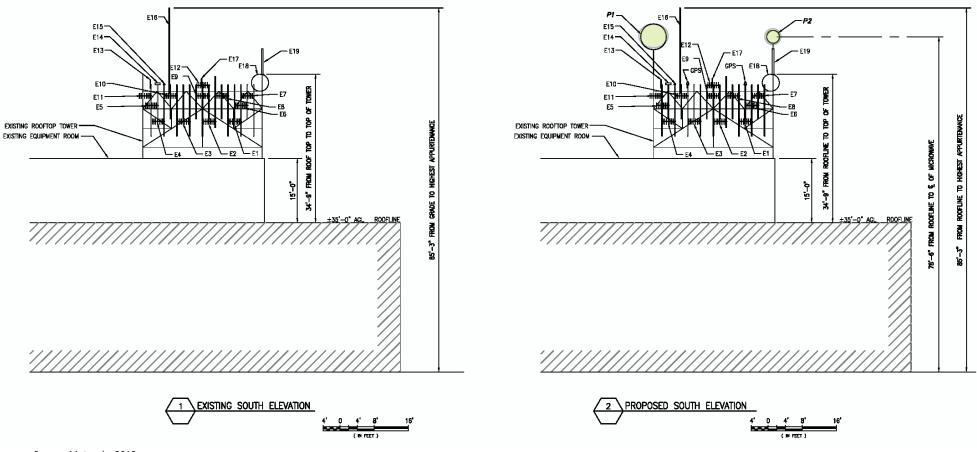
Site 1 - Prime Site EOF Existing and Proposed Elevations
